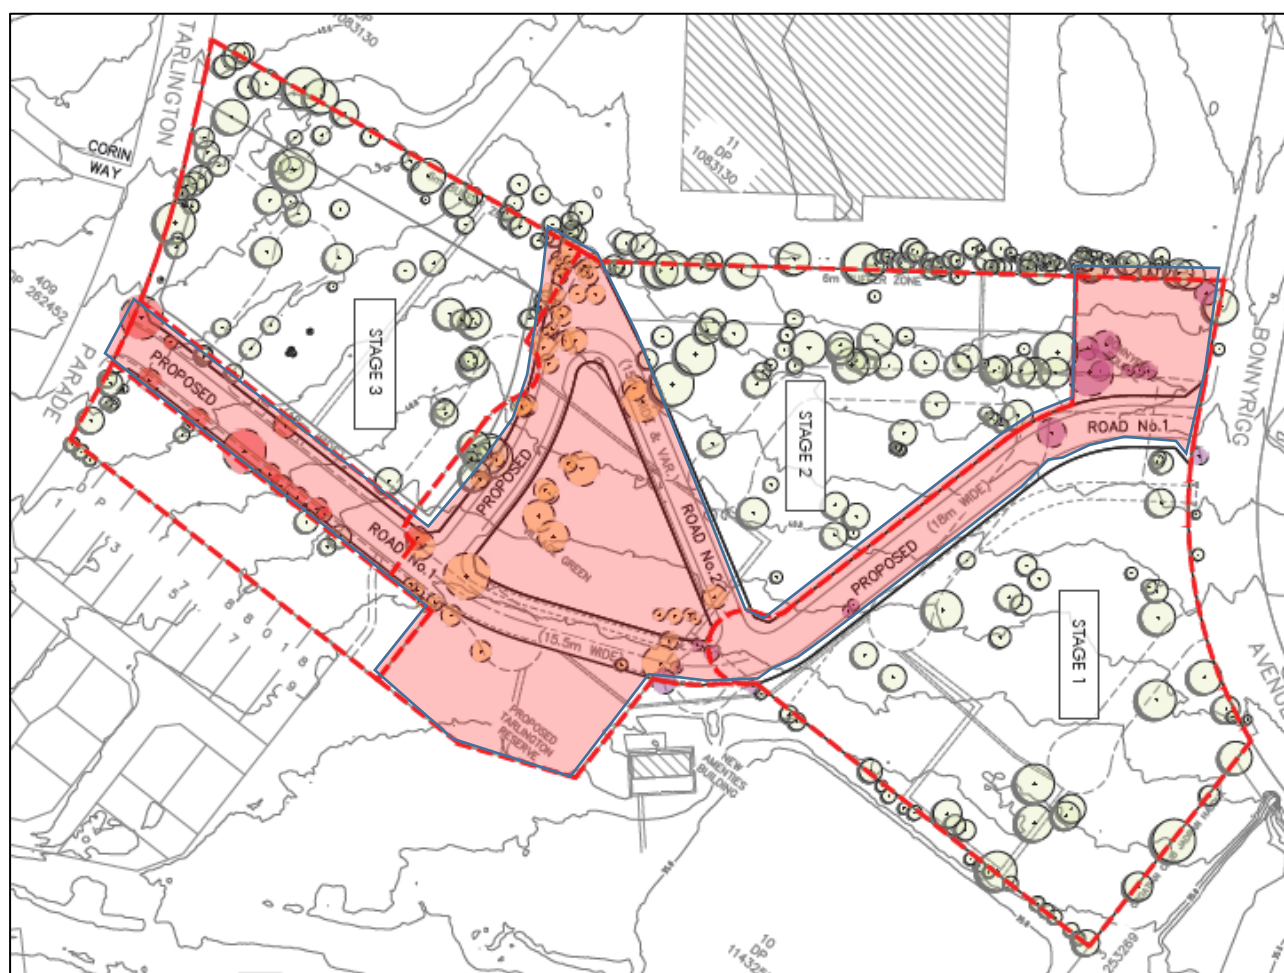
Staged Tree Removal Plan (Landscape Plan, Sheet No. 06-22.10)
